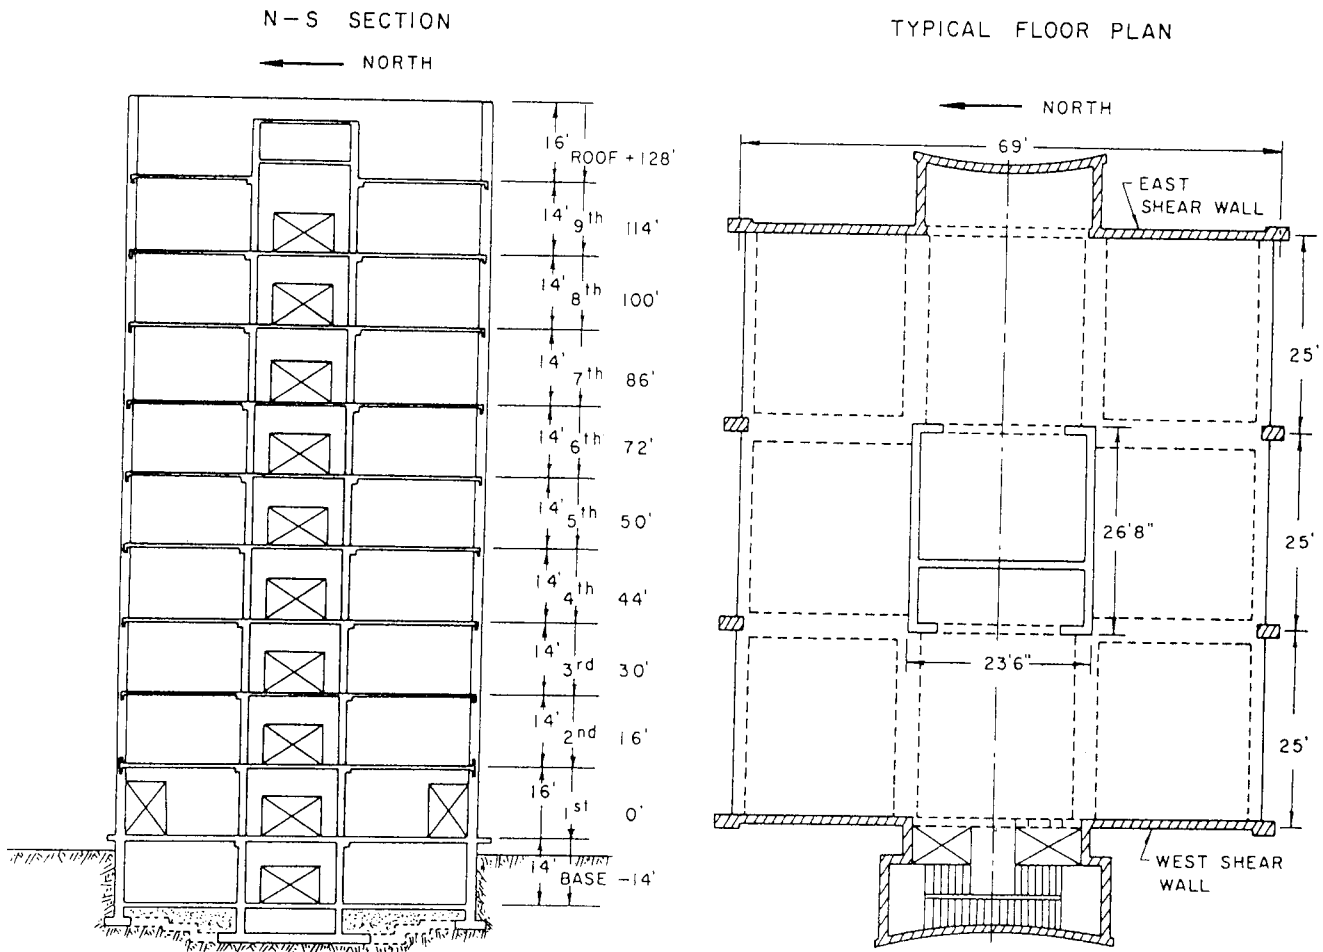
Millikan Library Building: NS elevation and typical floor plan
